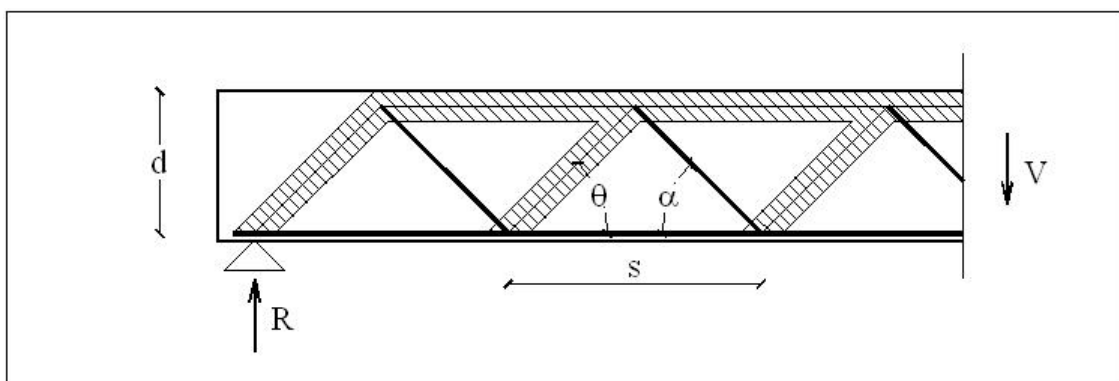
Shear composite truss mechanisms of a typical CSTC beam
